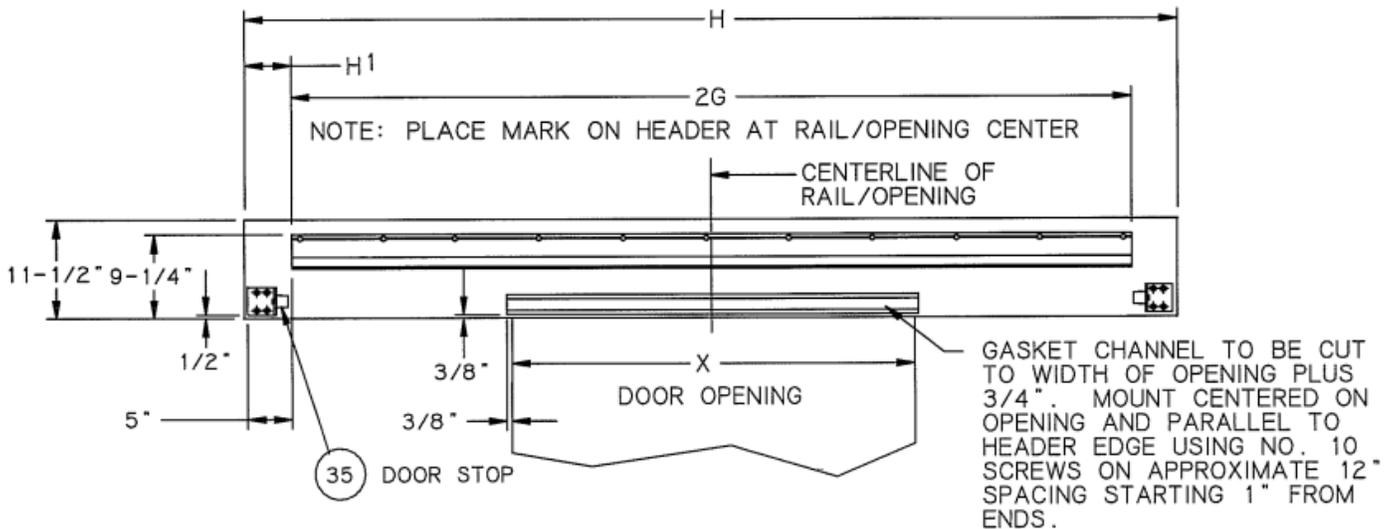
shows a completed Header Assembly of a Manual Bi-part Door System
